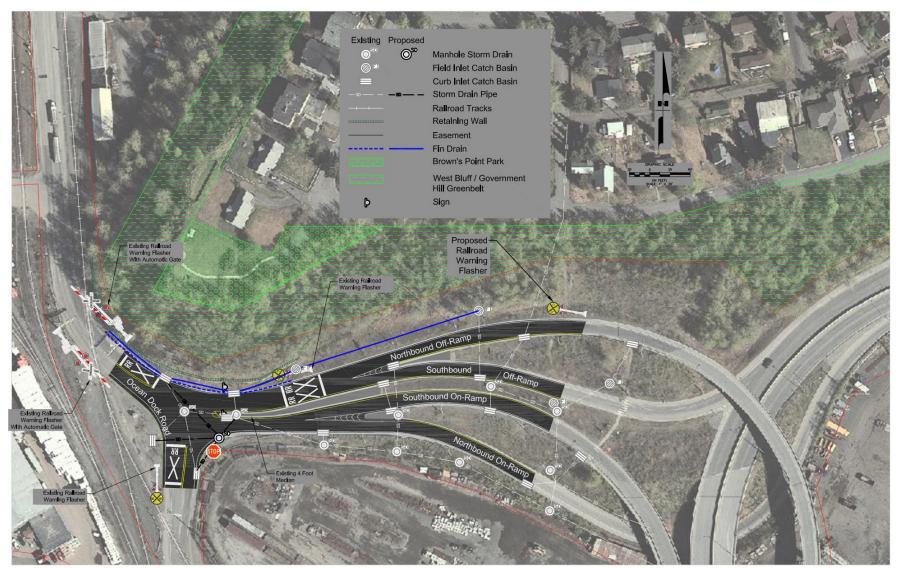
Alternative 2 - Repair Damaged Pavement and Install Drainage Improvements
